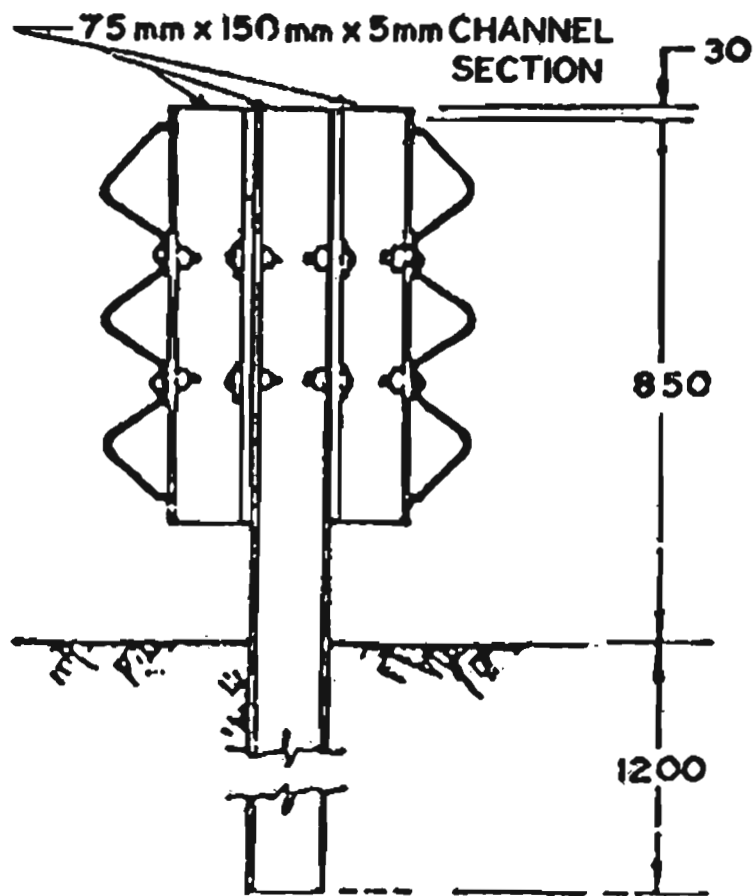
TYPICAL DETAILS OF THREE BEAM MEDIAN BARRIER
